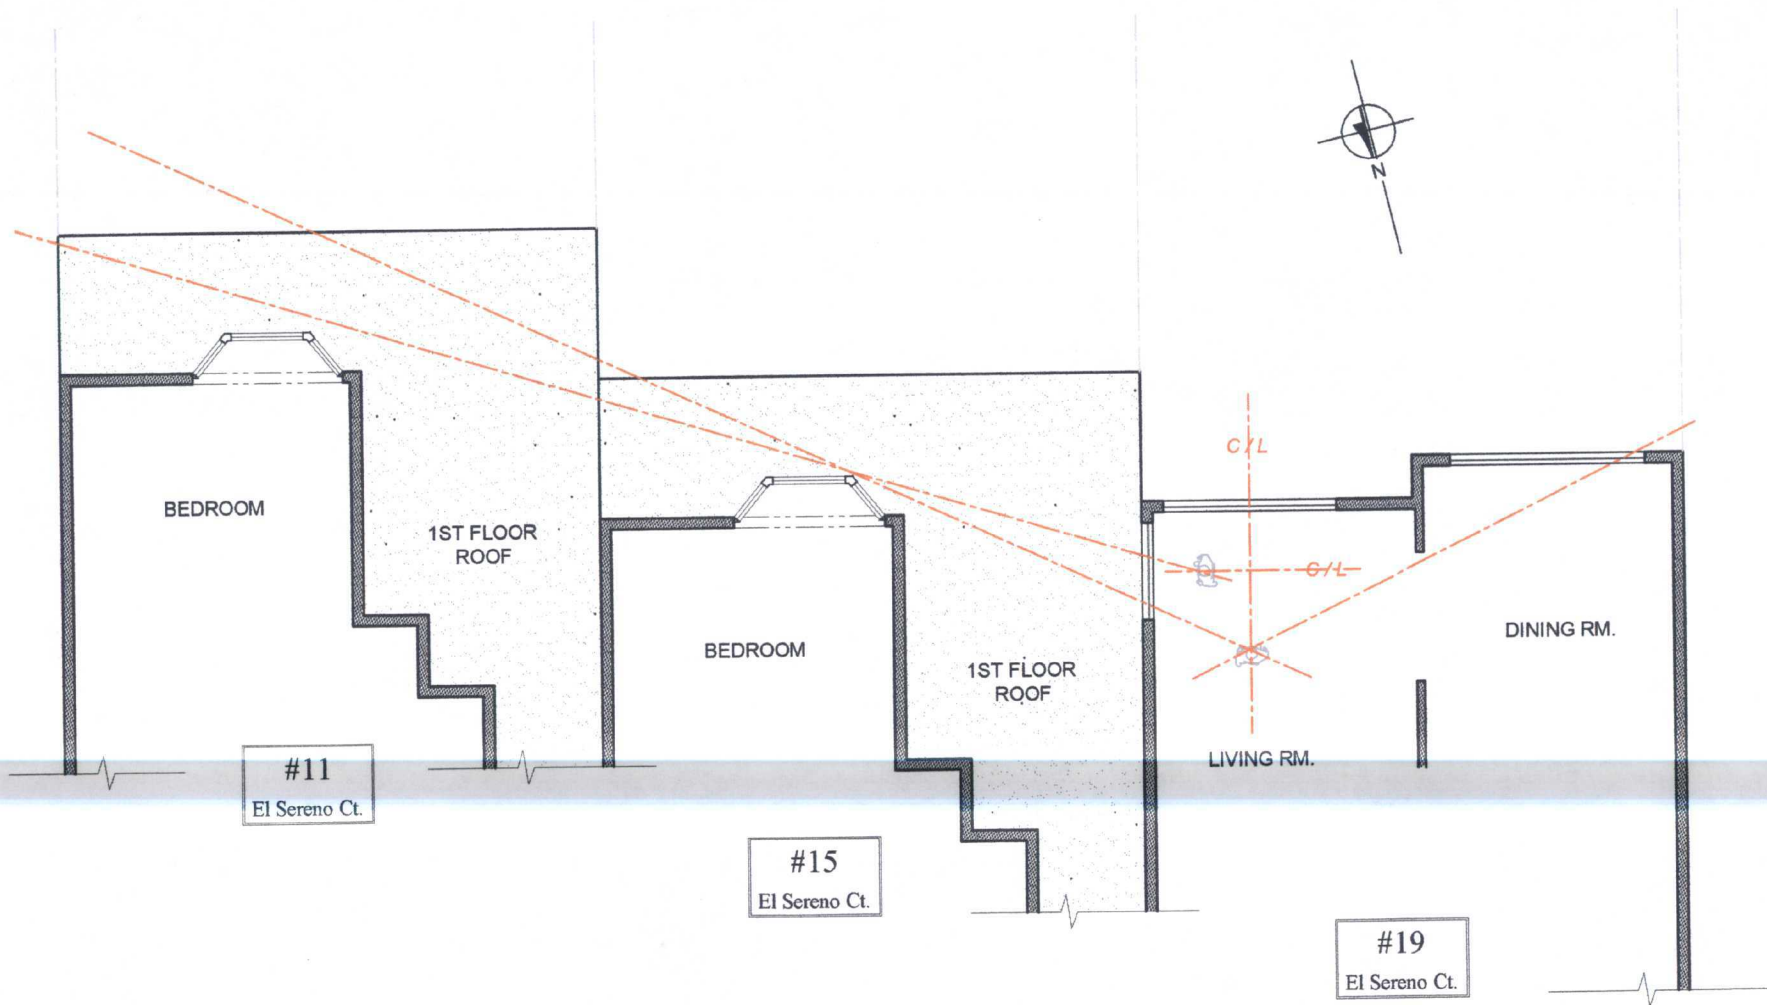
Sight line from 6 ft 3 inches back from south facing window
